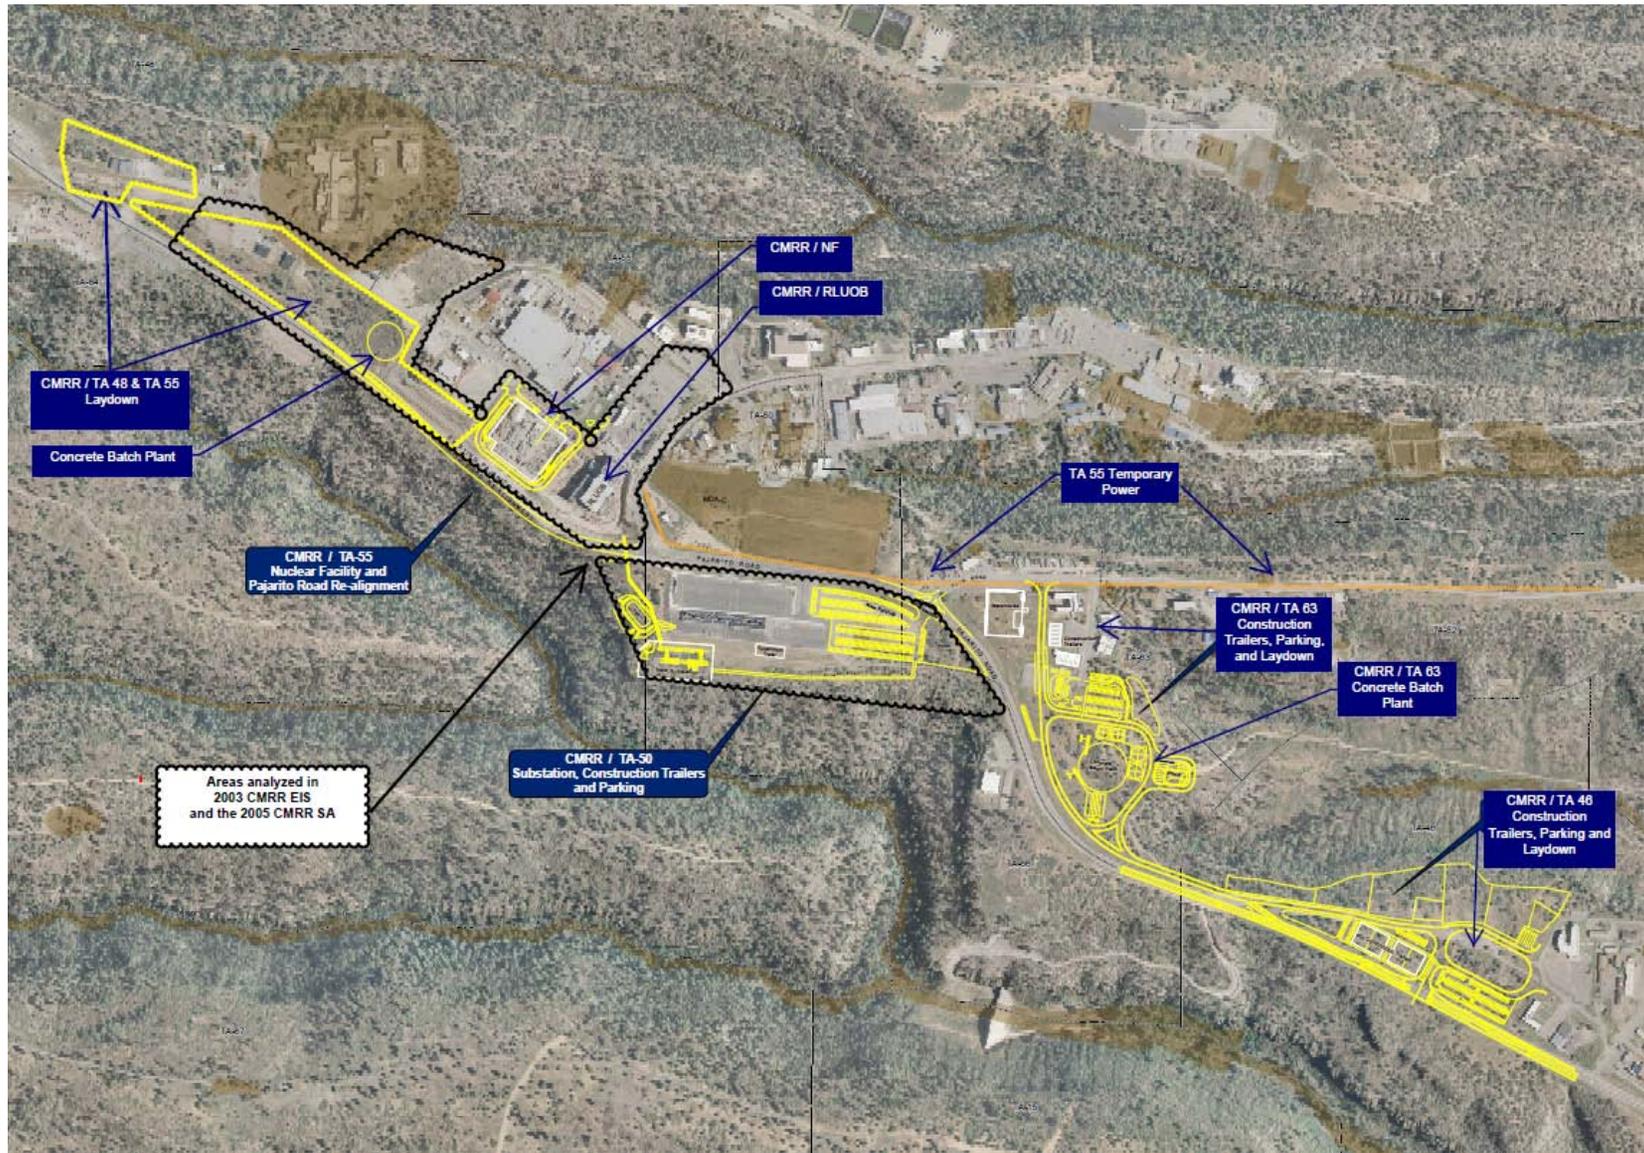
Locations for CMRR Project Planned and Proposed Actions.
